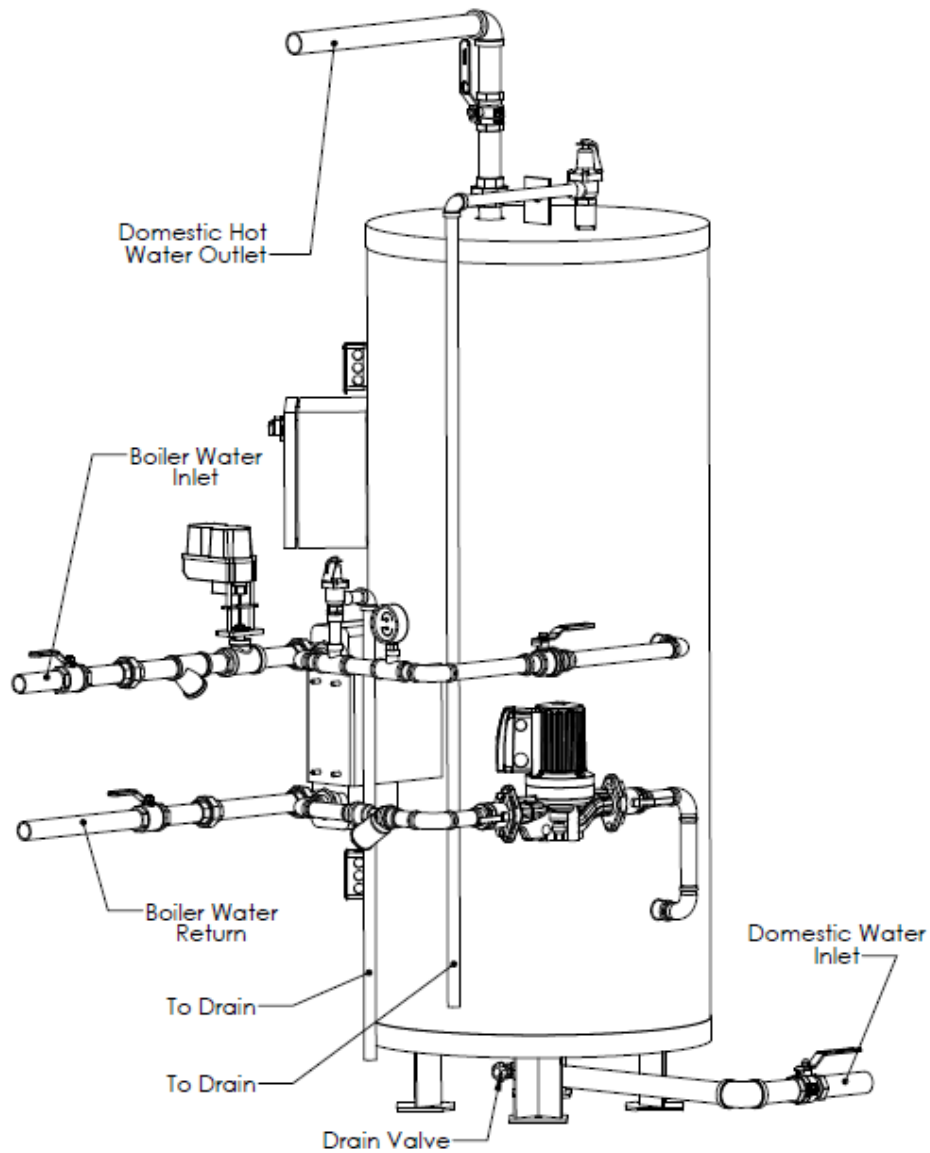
Installation Diagram of an Integrally Mounted Single Pass Heat Exchanger.
